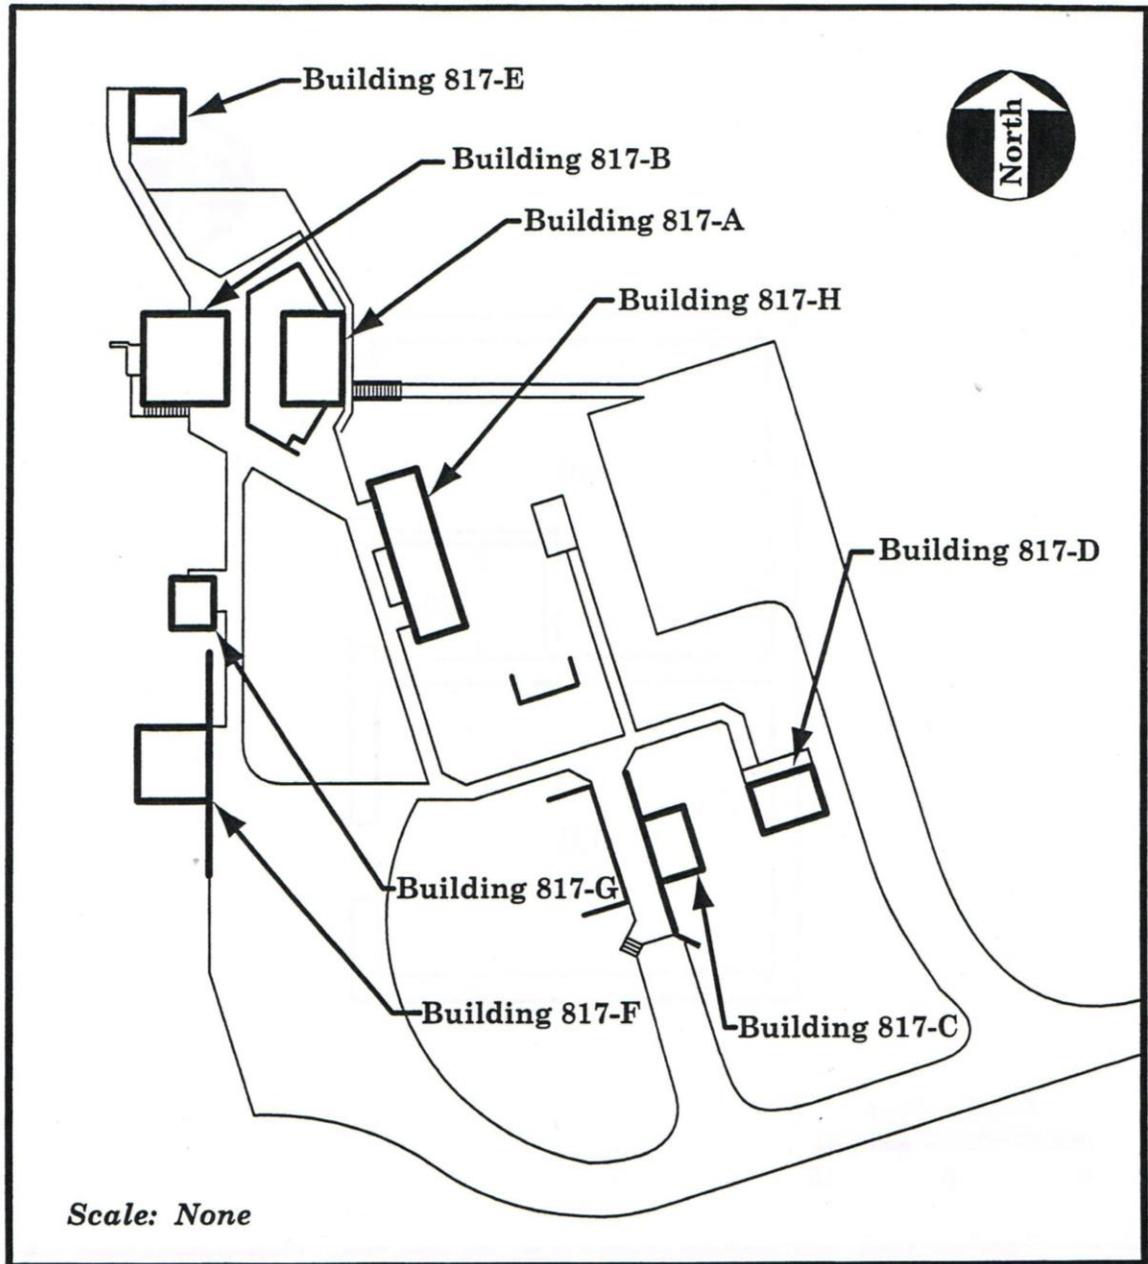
Building 817 Complex, Facility Plot Plan, 1997. LLNL Archives, (Figure A-9)
